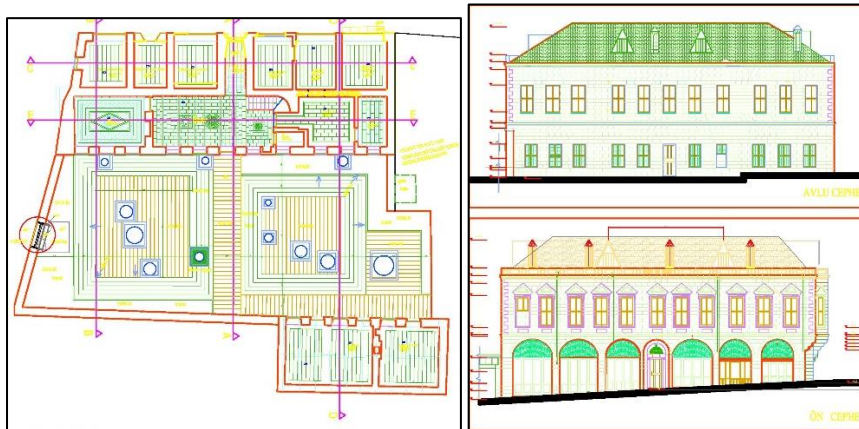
Restoration project of Cenani Mansion- (a) plans (b) elevations
